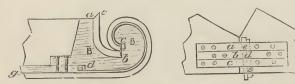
Plan of Curtail Step. Fig. 181.—Method of Cramping Joint.
